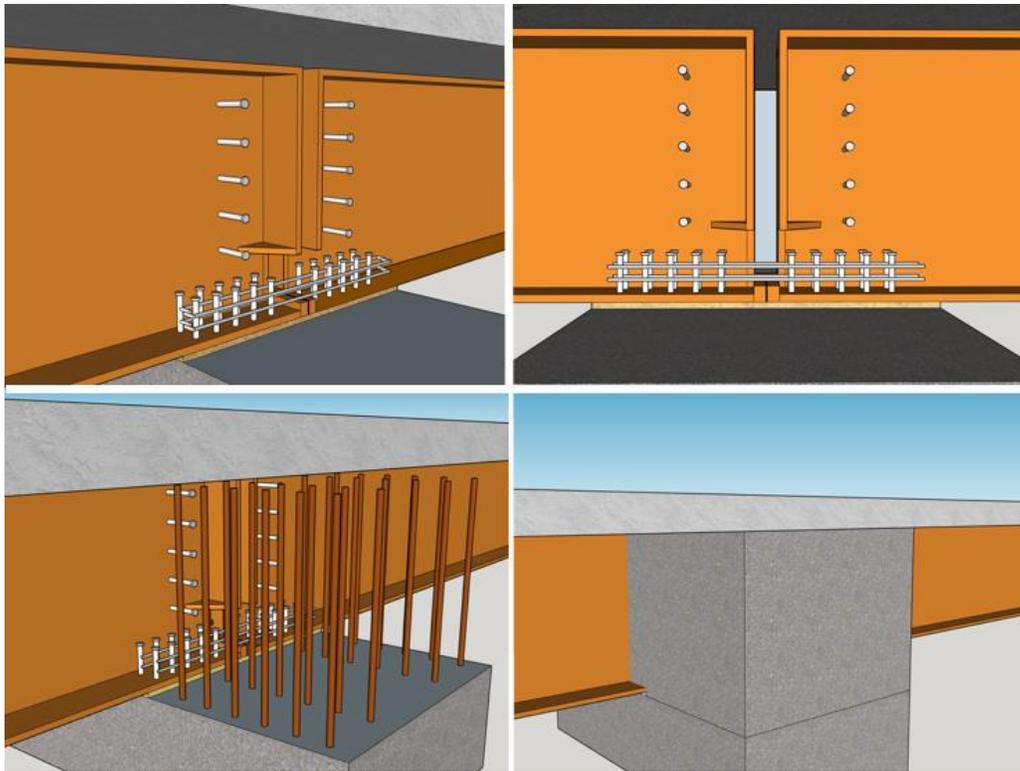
Revised seismic detail of SDCL bridge connection over the pier.
